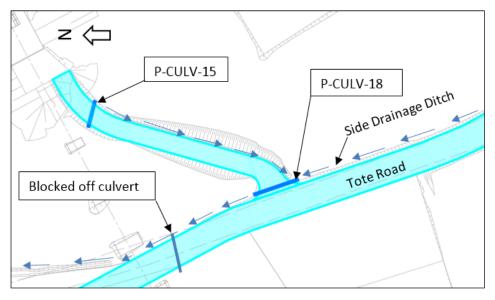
Dumper Tunnel Access Road Drainage Plan
